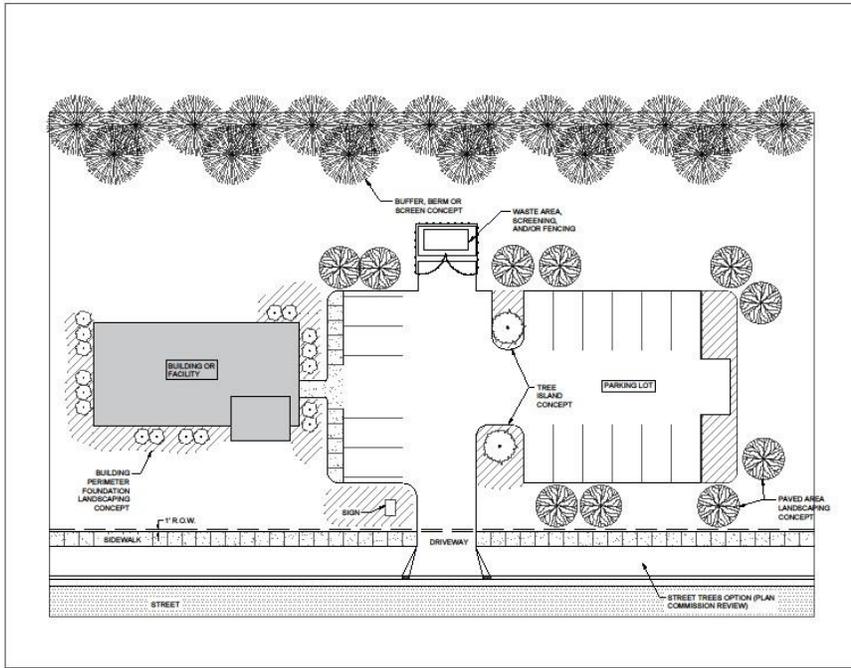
Landscaping Concept Schematic (Restricted Site)
